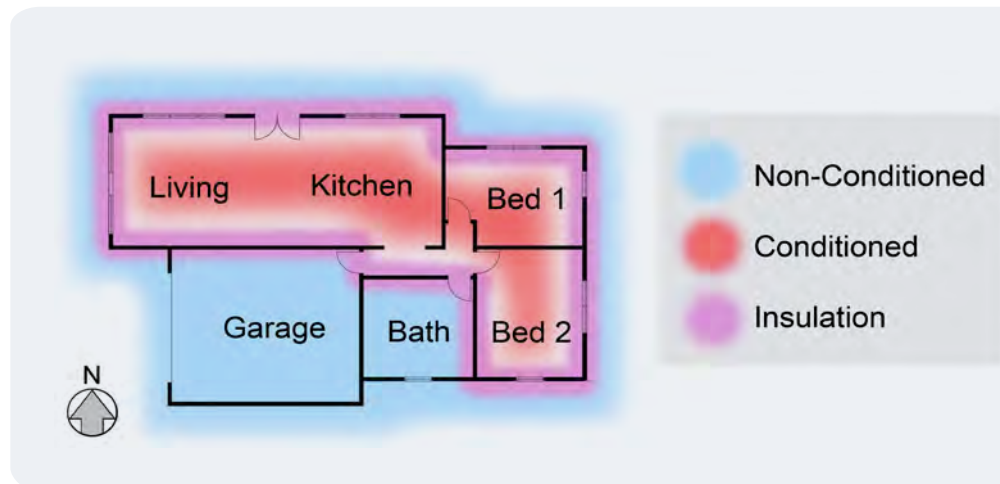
Separate conditioned rooms. Insulate internal as well as external walls to contain heating and cooling.
